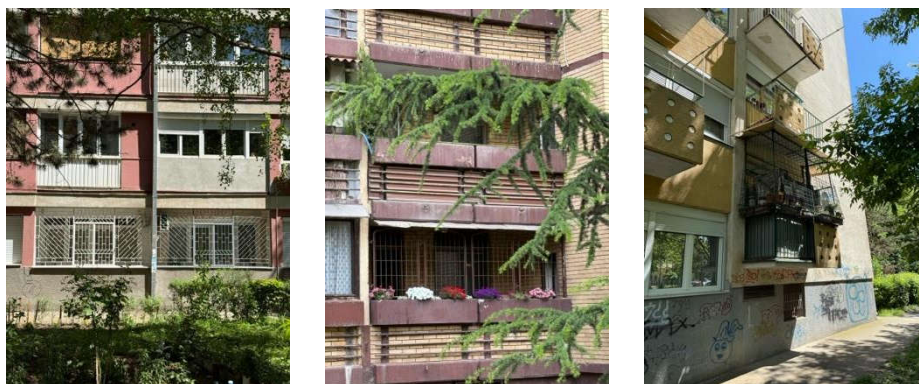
Examples of installing sun shading in apartment buildings in Niš,
